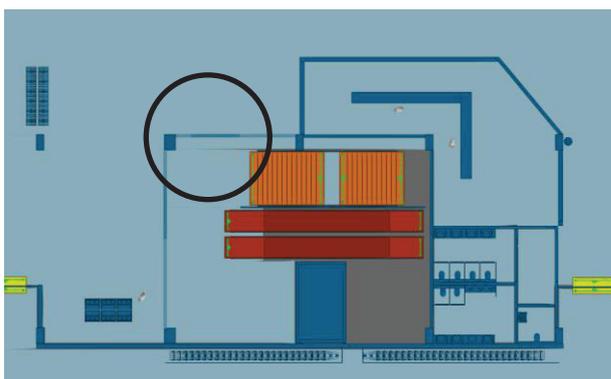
Detail of the bathroom and access to the 3rd floor. Source: Own elaboration.
